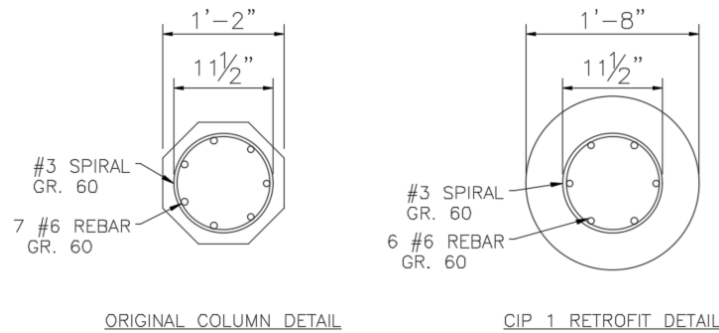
Original CIP Pier and CIP 1 Retrofit 2 SAP2000 Cross-Sections
